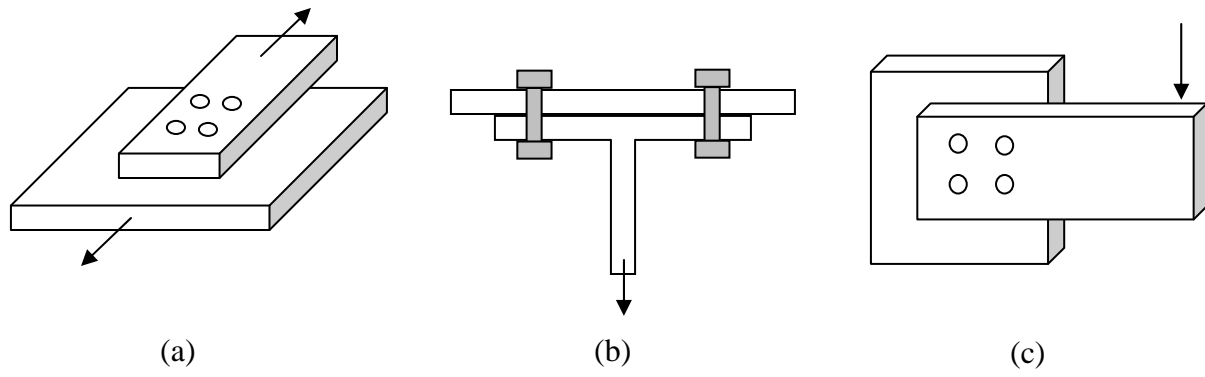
Types of bolted connections (a) Lapped tension splice (b) Hanger type connection (c) Bracket type connection
